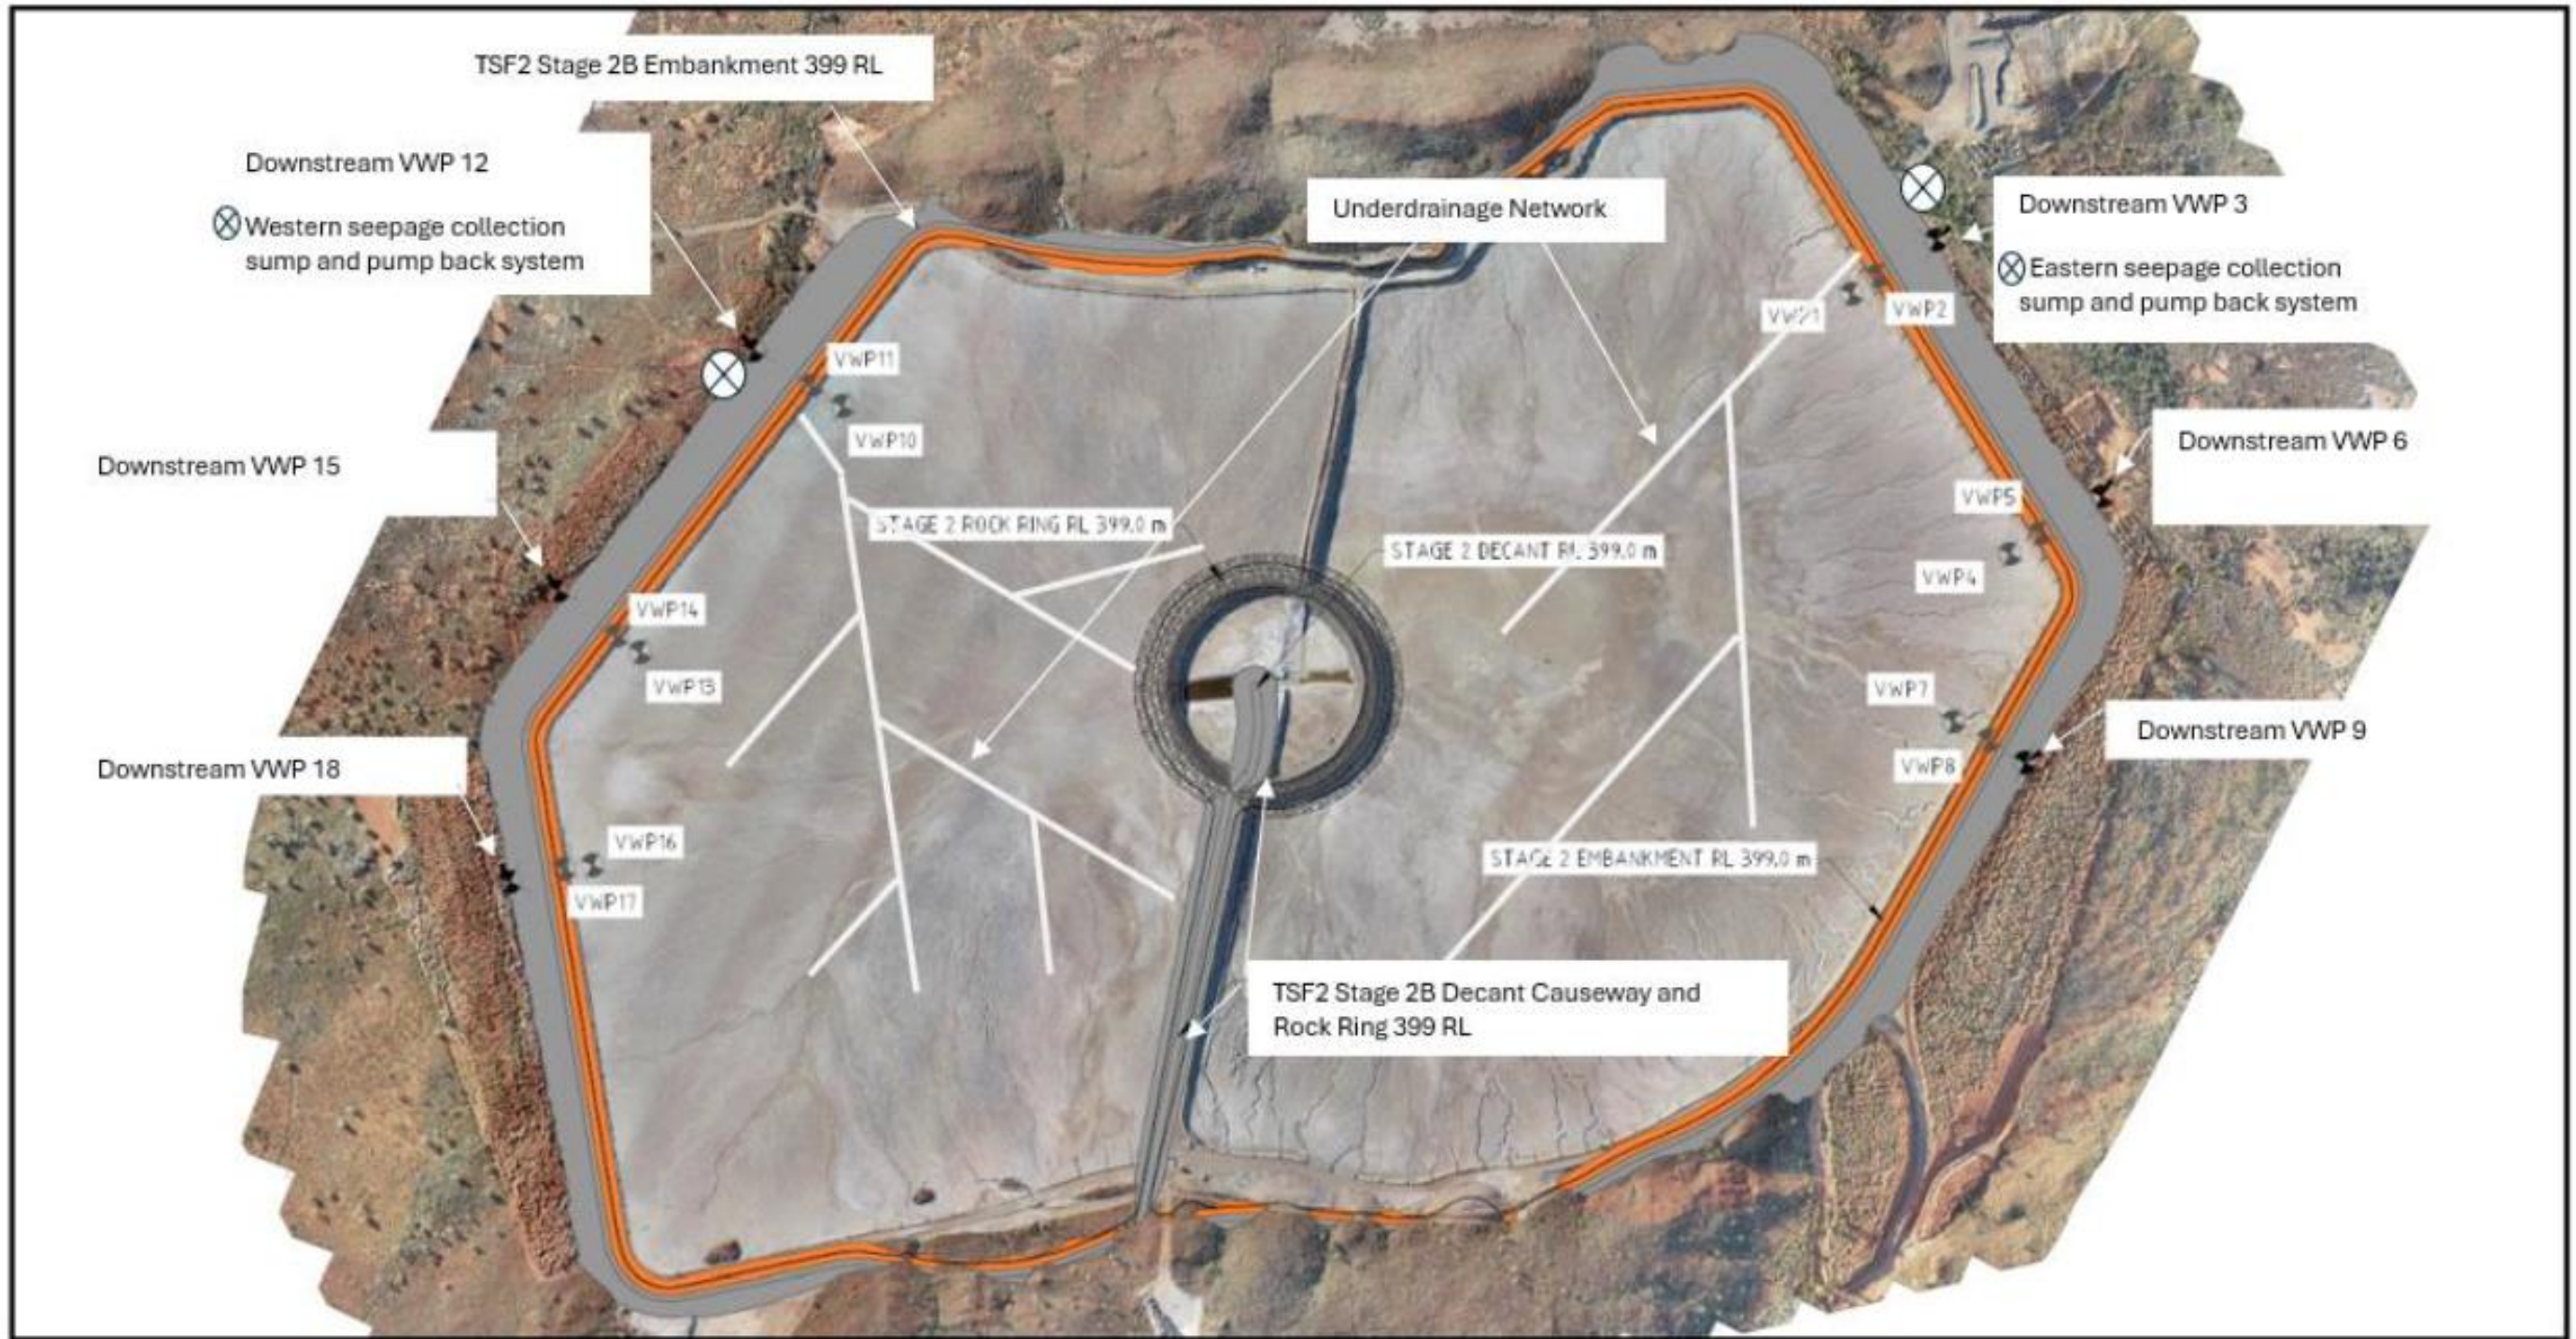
Diagram depicting the underdrainage system, decant structure, toe drain and piezometers
